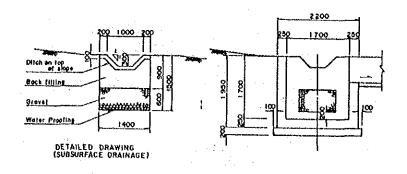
(8) Subsurface Drainage (Type 14)
